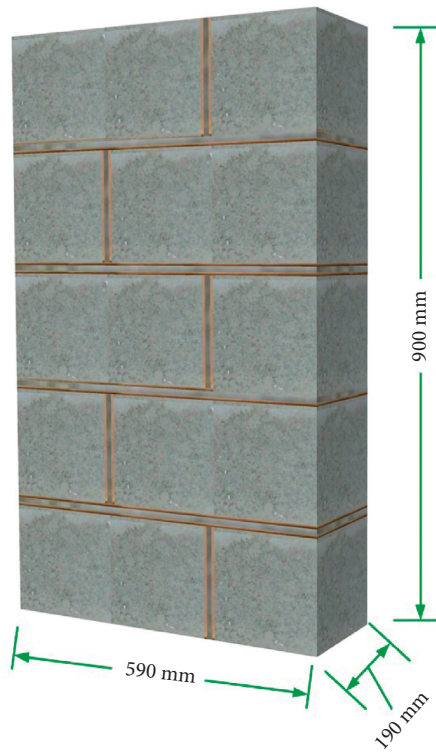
Dimensions of masonry wallets (all dimensions are in mm).
